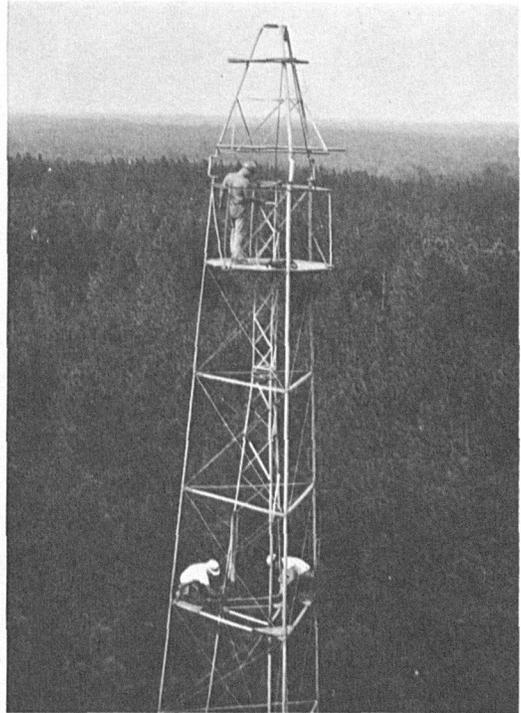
Bolting the built-up section to the top of the red 37-ft. section.
